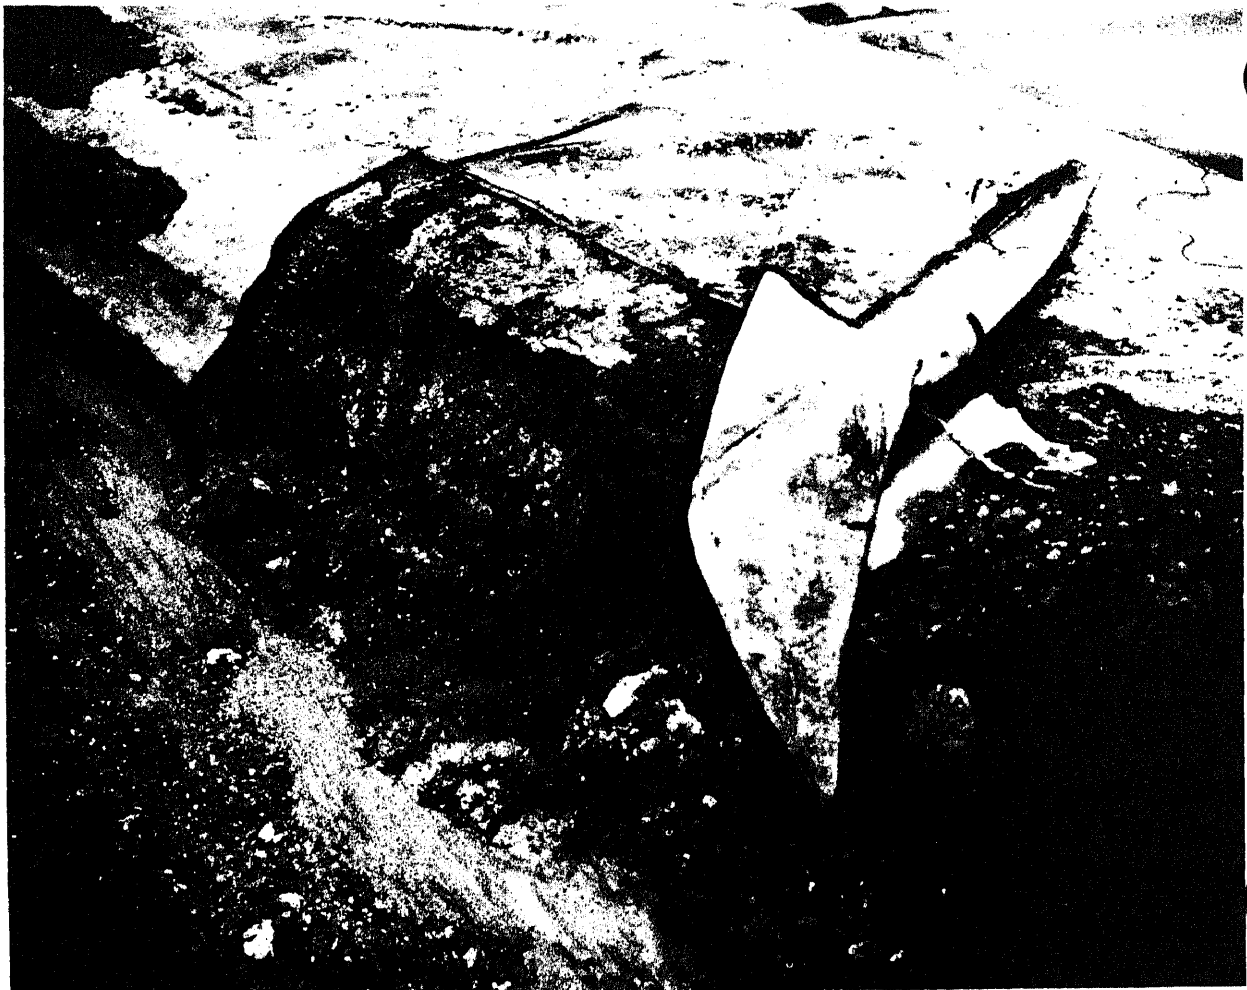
(Added) Tear caused by grader opening anchor ditch.
